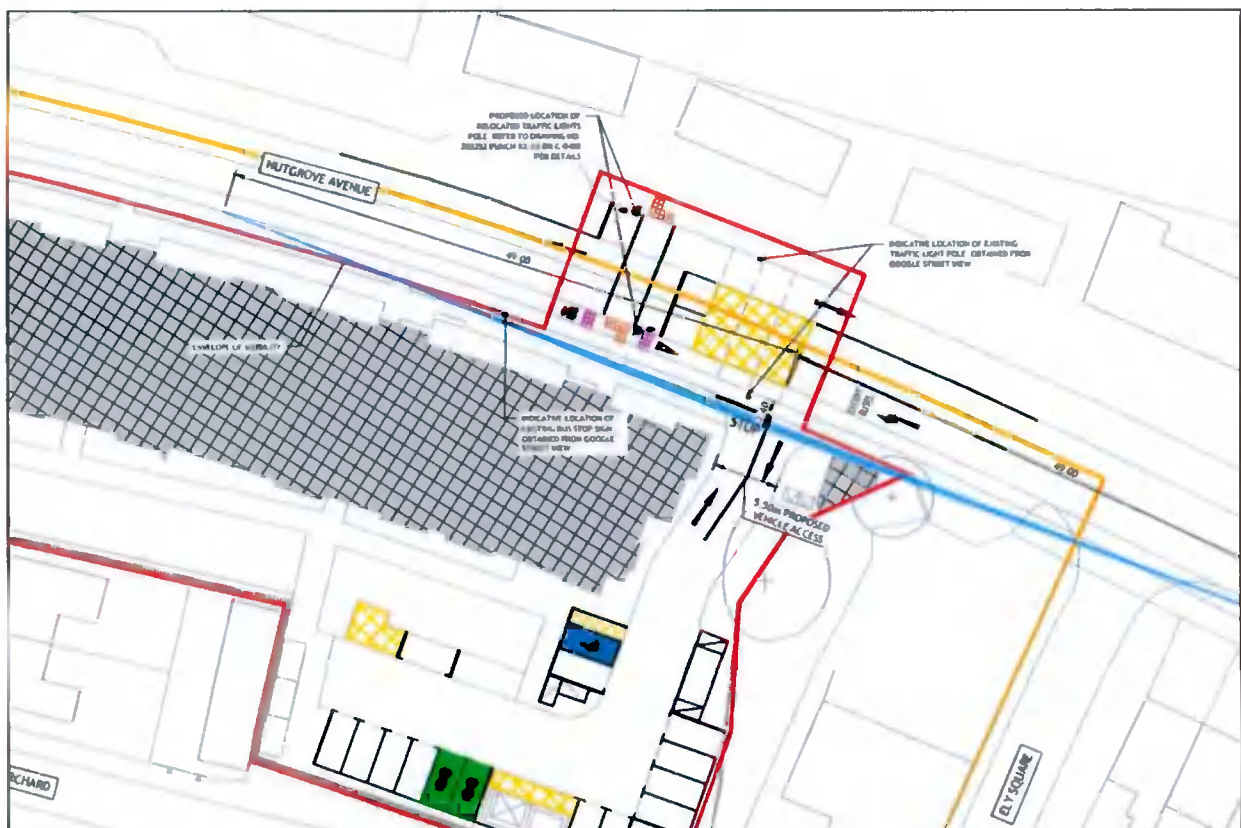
LOCATION OF EXISTING TRAFFIC LIGHTS AND PEDESTRIAN CROSSING AND PROPOSED RELOCATION AND ROAD LINE MARKINGS (SOURCE: PUNCH)
